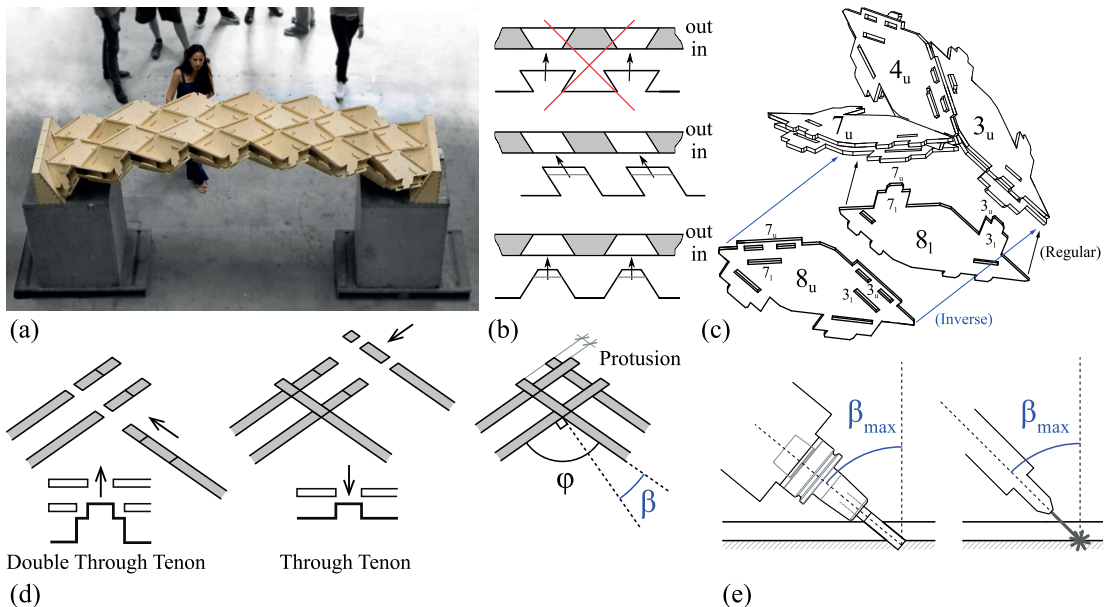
2016 - Doubly-curved shell with two layers and Miura-Ori pattern [RW16] : (a) Double-layered folded plate structure, (b) Assembly of the upper and the lower plates of a mountain fold, (c) 2-layer assembly, (d) Fabrication constraints : tool inclination angle β_{max}
